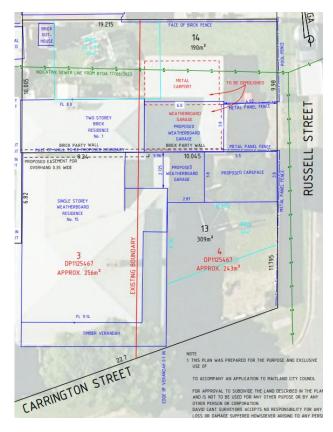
Proposed plan of subdivision showing existing and proposed boundaries, with existing structures.
